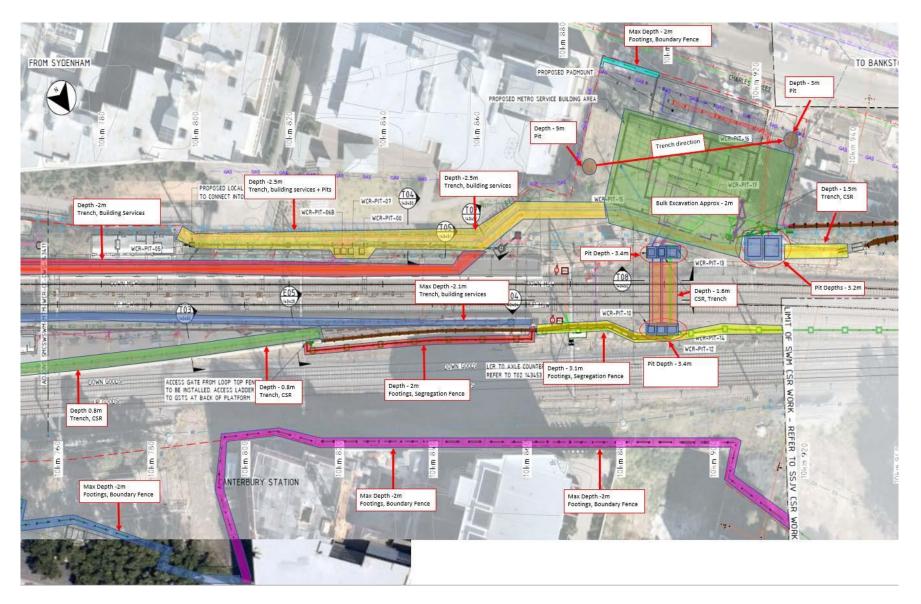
Plans showing the extent of remaining works at Canterbury Station that involve excavation, including the MSB site to the western extent of the project boundary (Source: HSEJV 2021).
